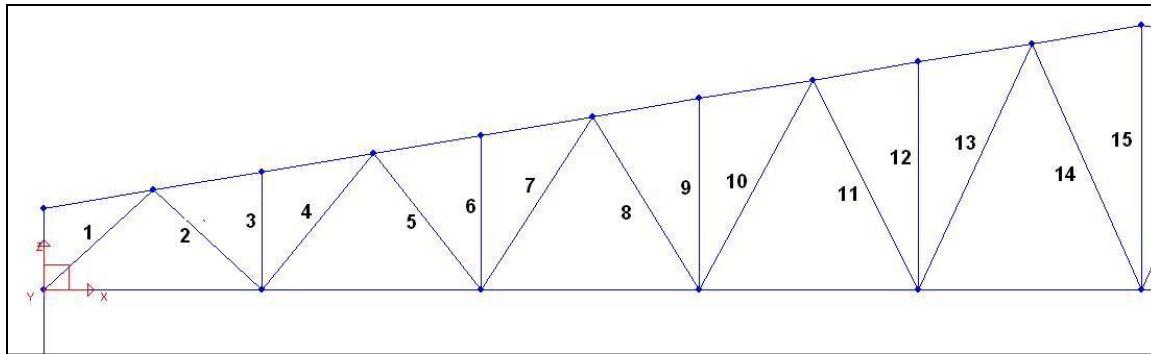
Typical Interior Truss S-Frame Model Showing Member Numbers
